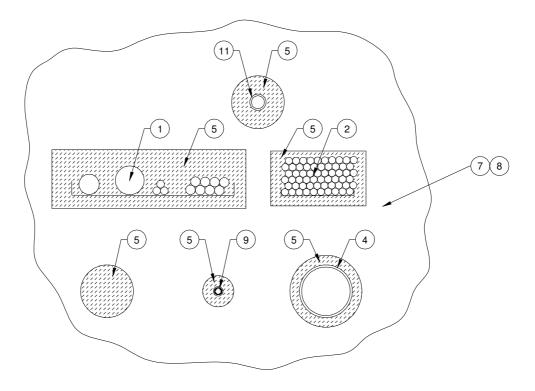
Typical Arrangement of 3M CP 25WB+ Sealant in Walls
